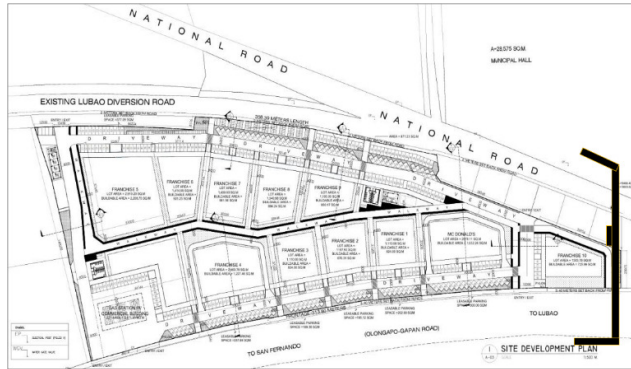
Site Development Plan of BC Architects Design Corp. and final location of the footbridge.
